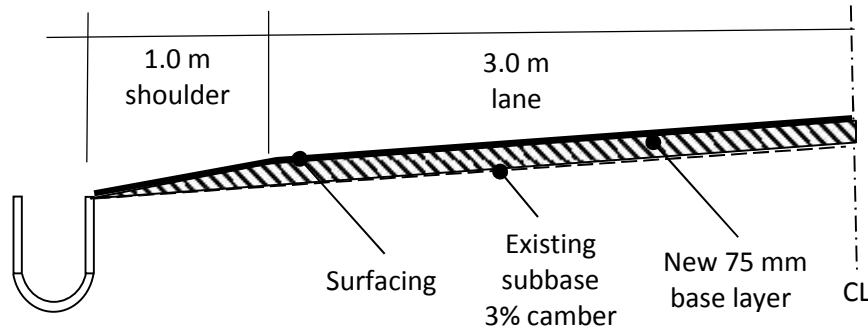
Reduced base layer on concrete U-drain section km 8+400 - 8+500
